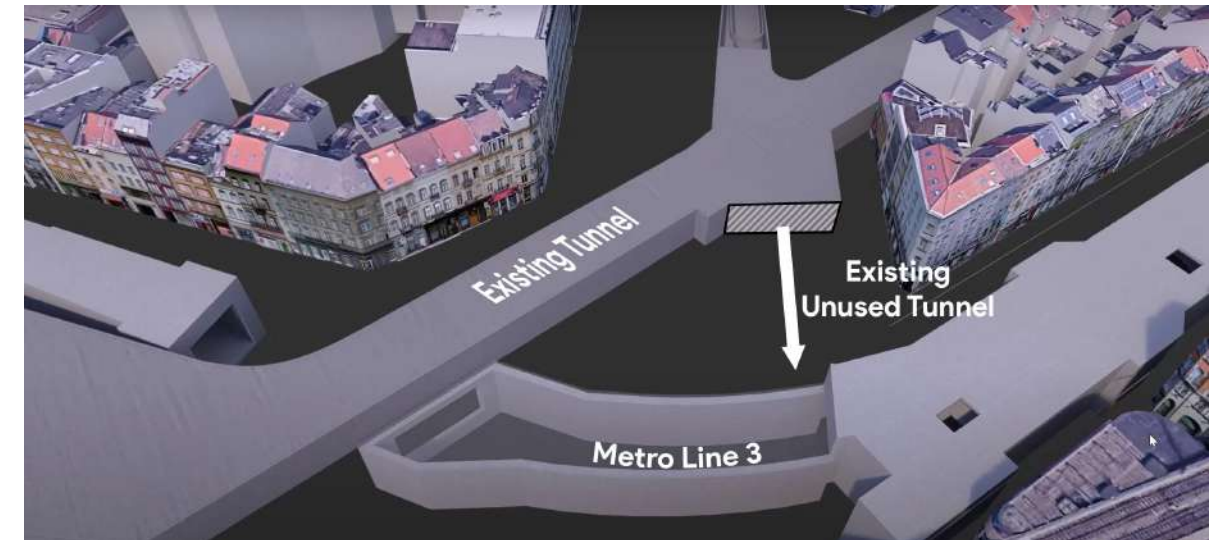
The location of the new underground tunnel and station for metro line 3 and the old tunnel
